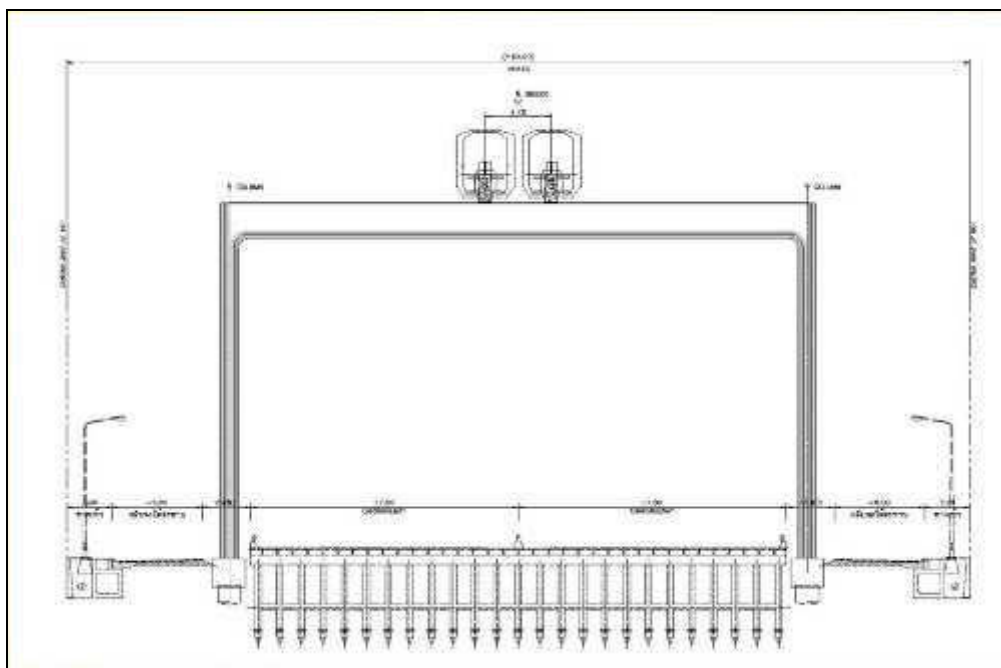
5 Cross section of road at Prawet Burirom Canal, 1<sup>st</sup> Alternative
